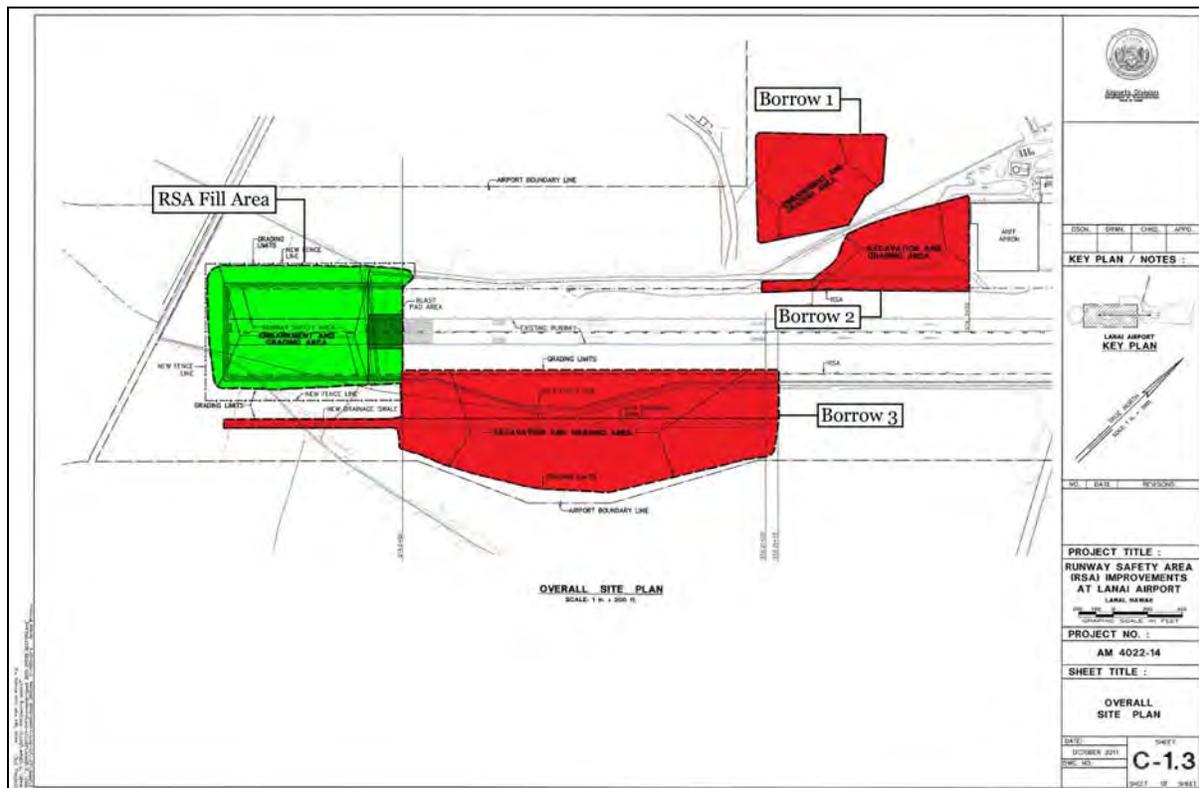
Proposed project site plan with areas of potential effect labeled, excavation and borrow areas in red and surface grading and fill area in green.
